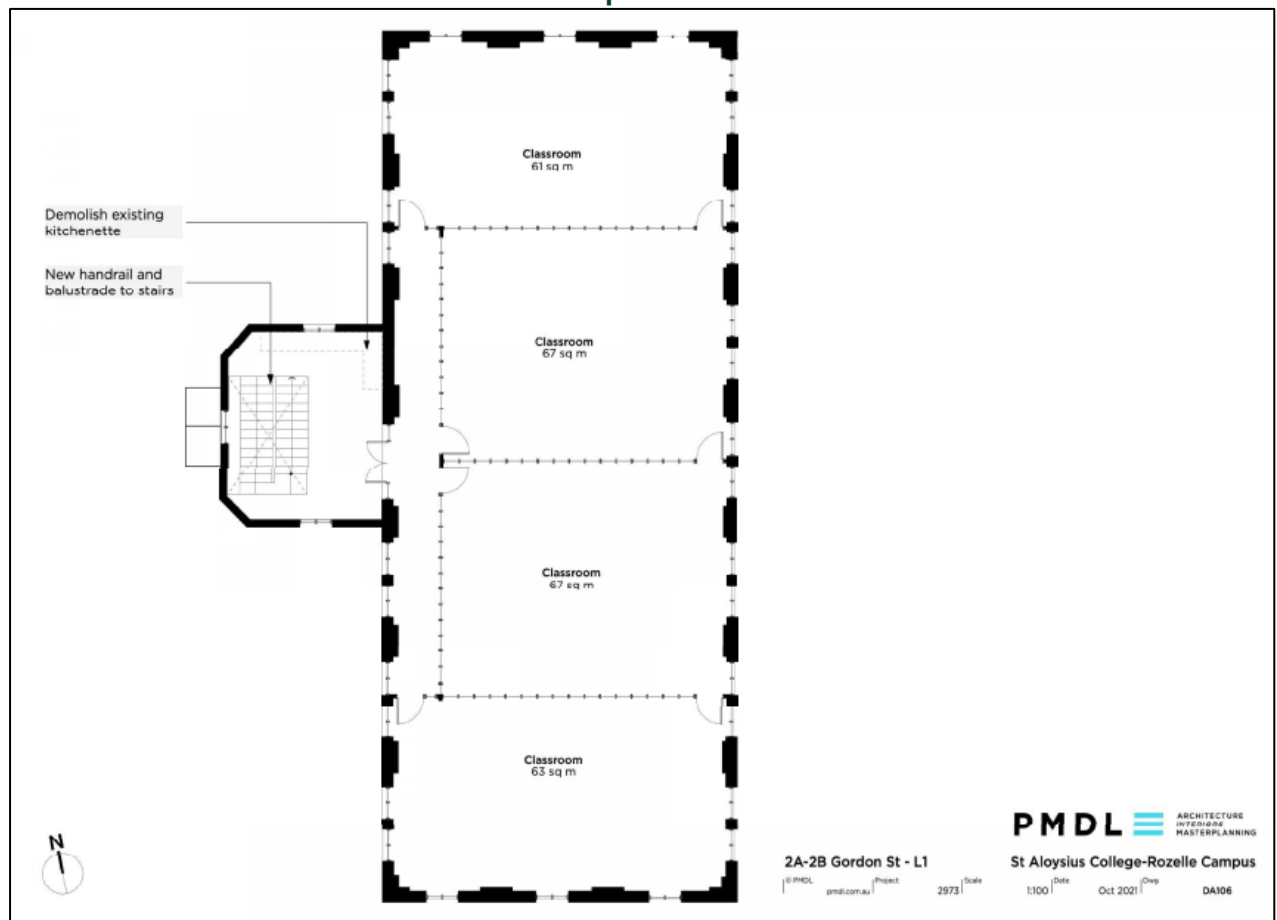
2A-2B Gordon St – L1 Floor Plan (PMDL, 2021)
